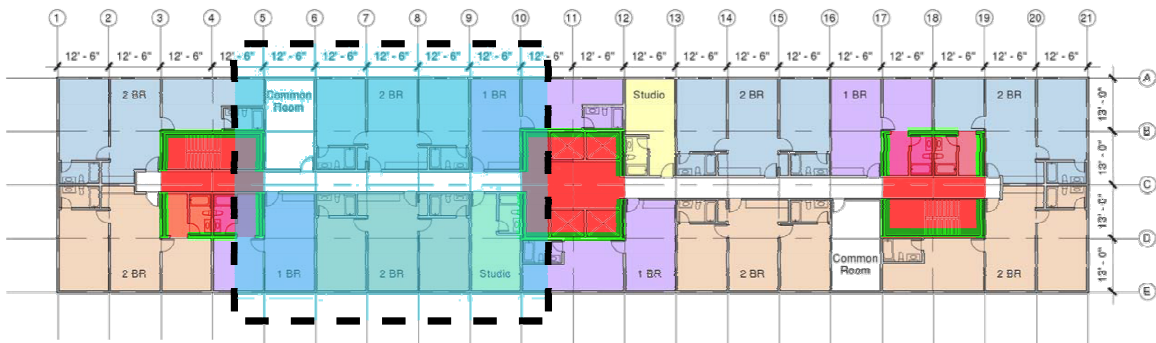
Typical floor plan with the typical bay considered for alternate floor systems highlighted in blue
